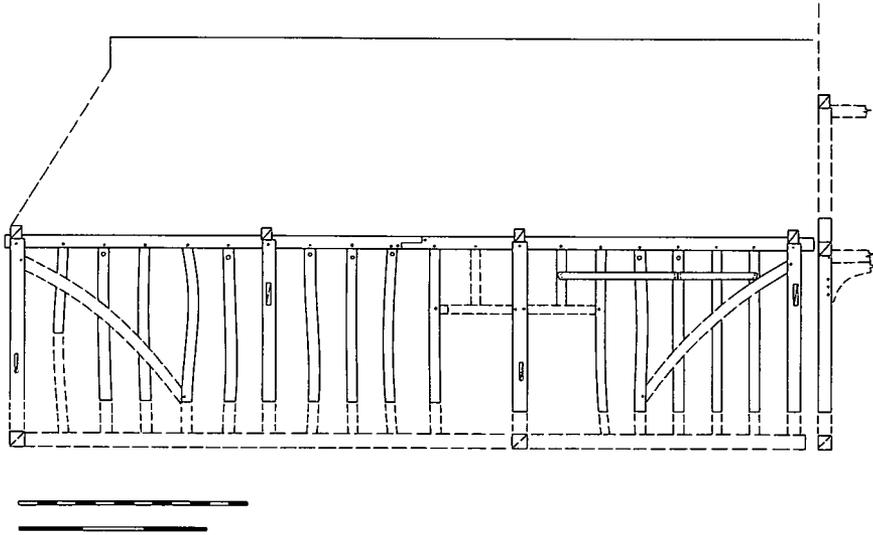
Stradbroke, White House Farm. Northern internal elevation of the early-17th-century stable, showing the two original doors and ‘diamond mullion’ windows with the taller structure of the barn to right. Scales in feet (top) and metres.
